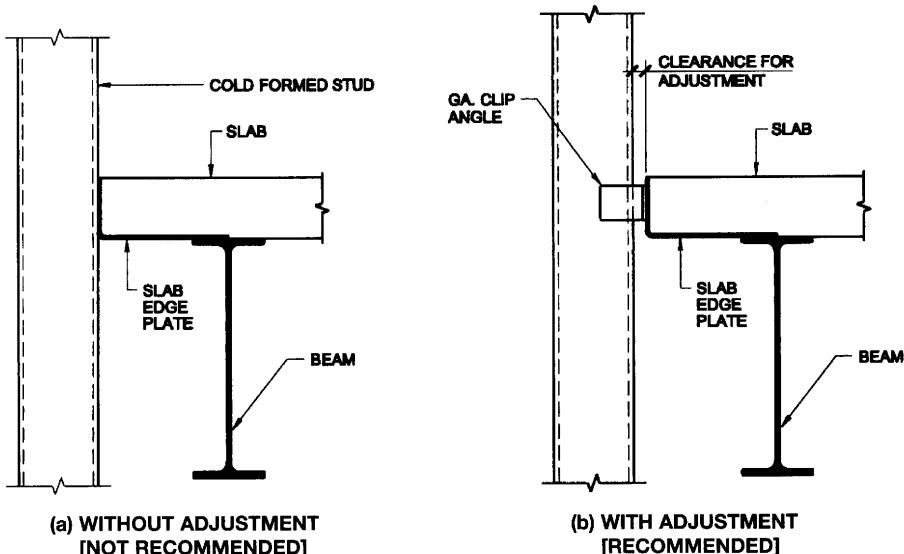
Attaching cold-formed steel façade systems to structural steel framing.
